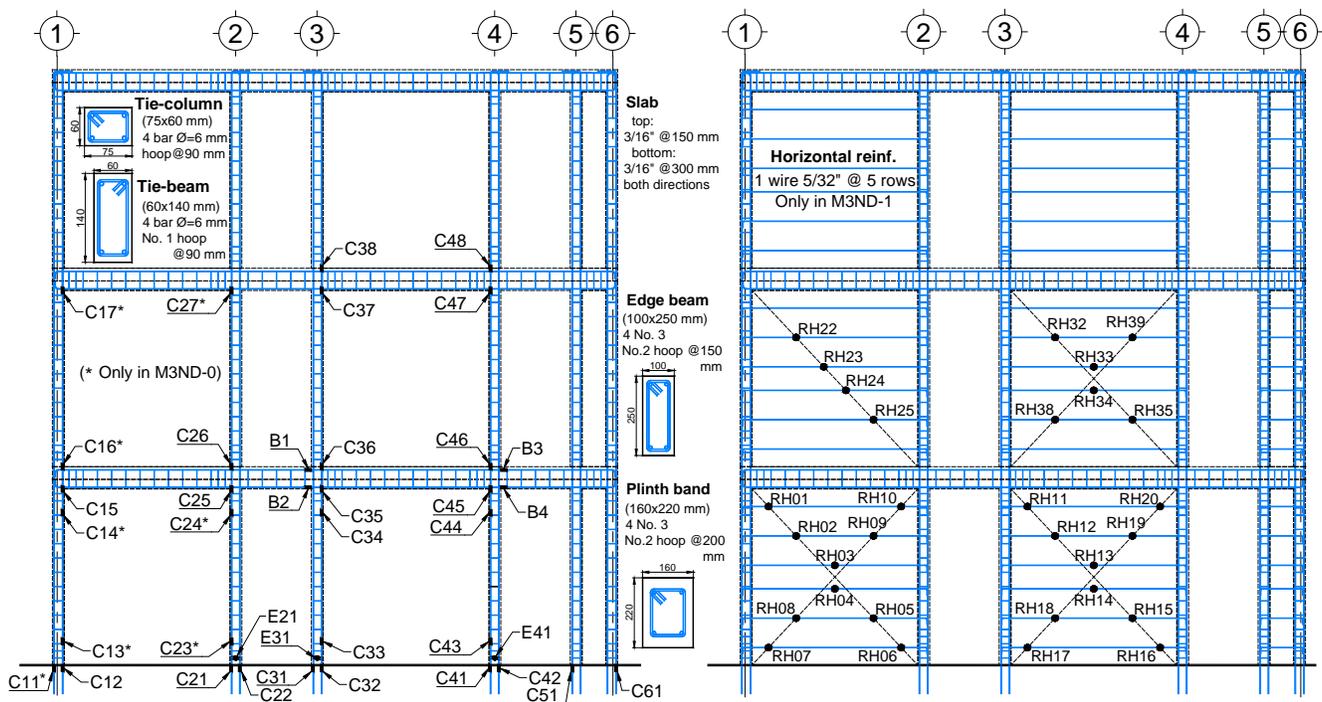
Steel reinforcement and strain gauge location; (horizontal reinforcement only in specimen M3ND-1)
